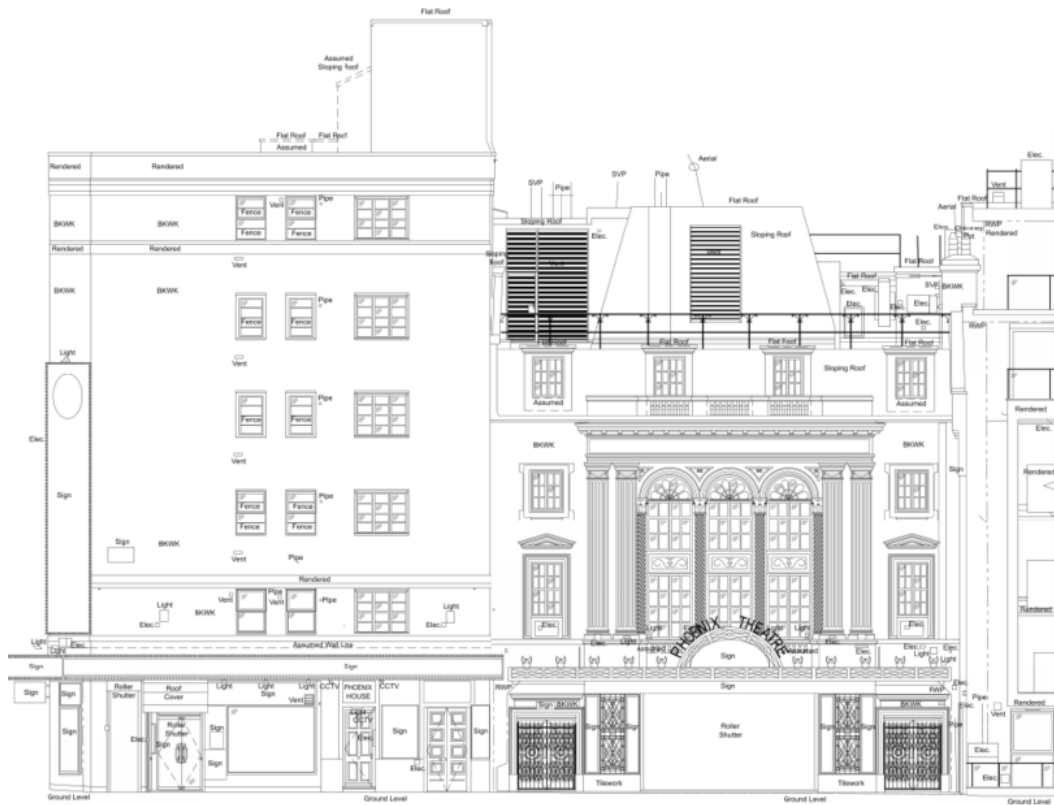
(above): Existing and proposed southern side elevation (from Phoenix Street)
